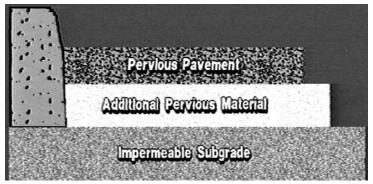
Typical section of Pervious Concrete. (Courtesy of Michael Young, SCCPA and NRMCA)
